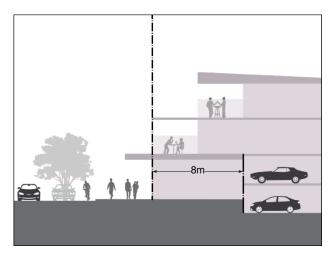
Permitted parking areas to ground floor level for commercial or mixed use development
